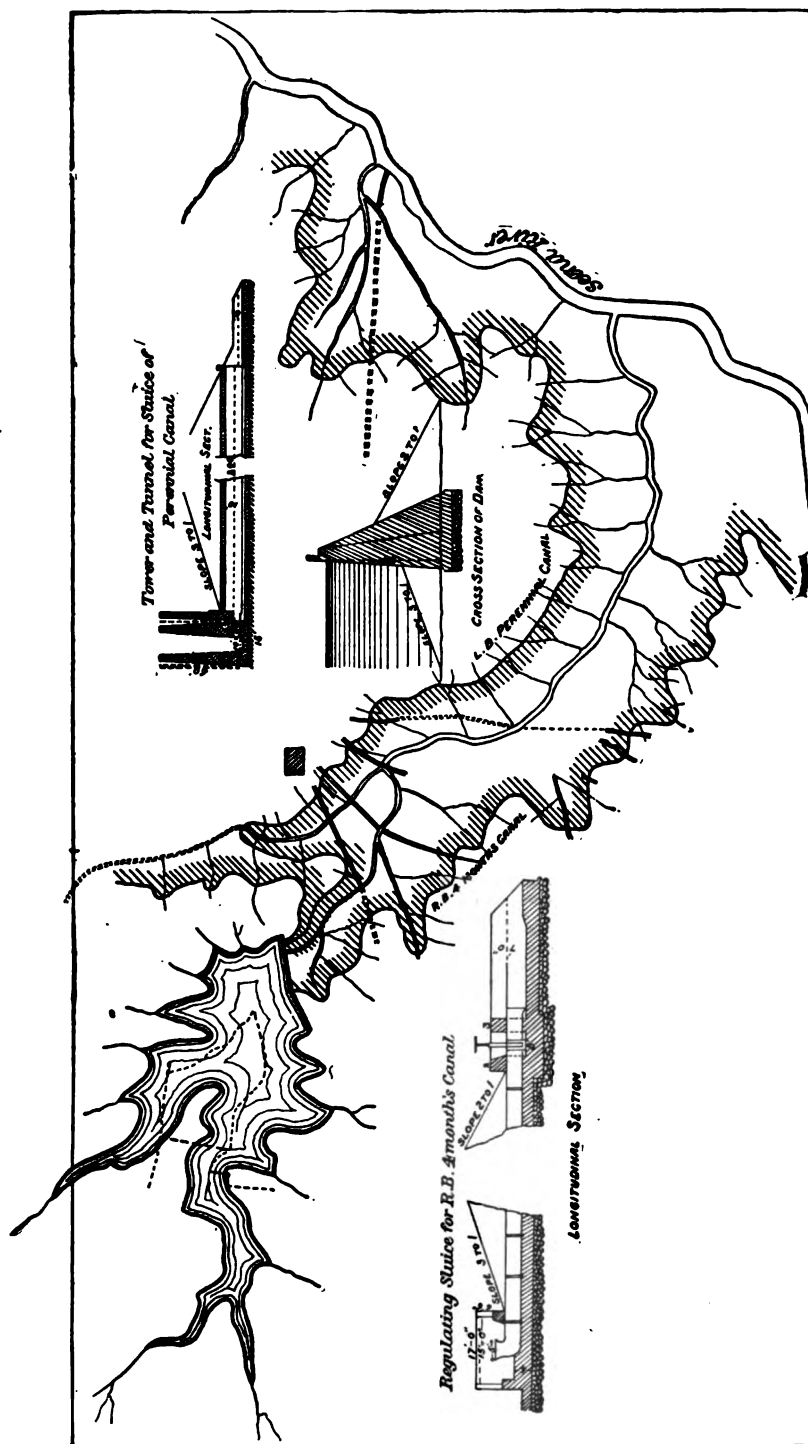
THE EKRUK TANK, BOMBAY. PLAN AND DETAILS.
